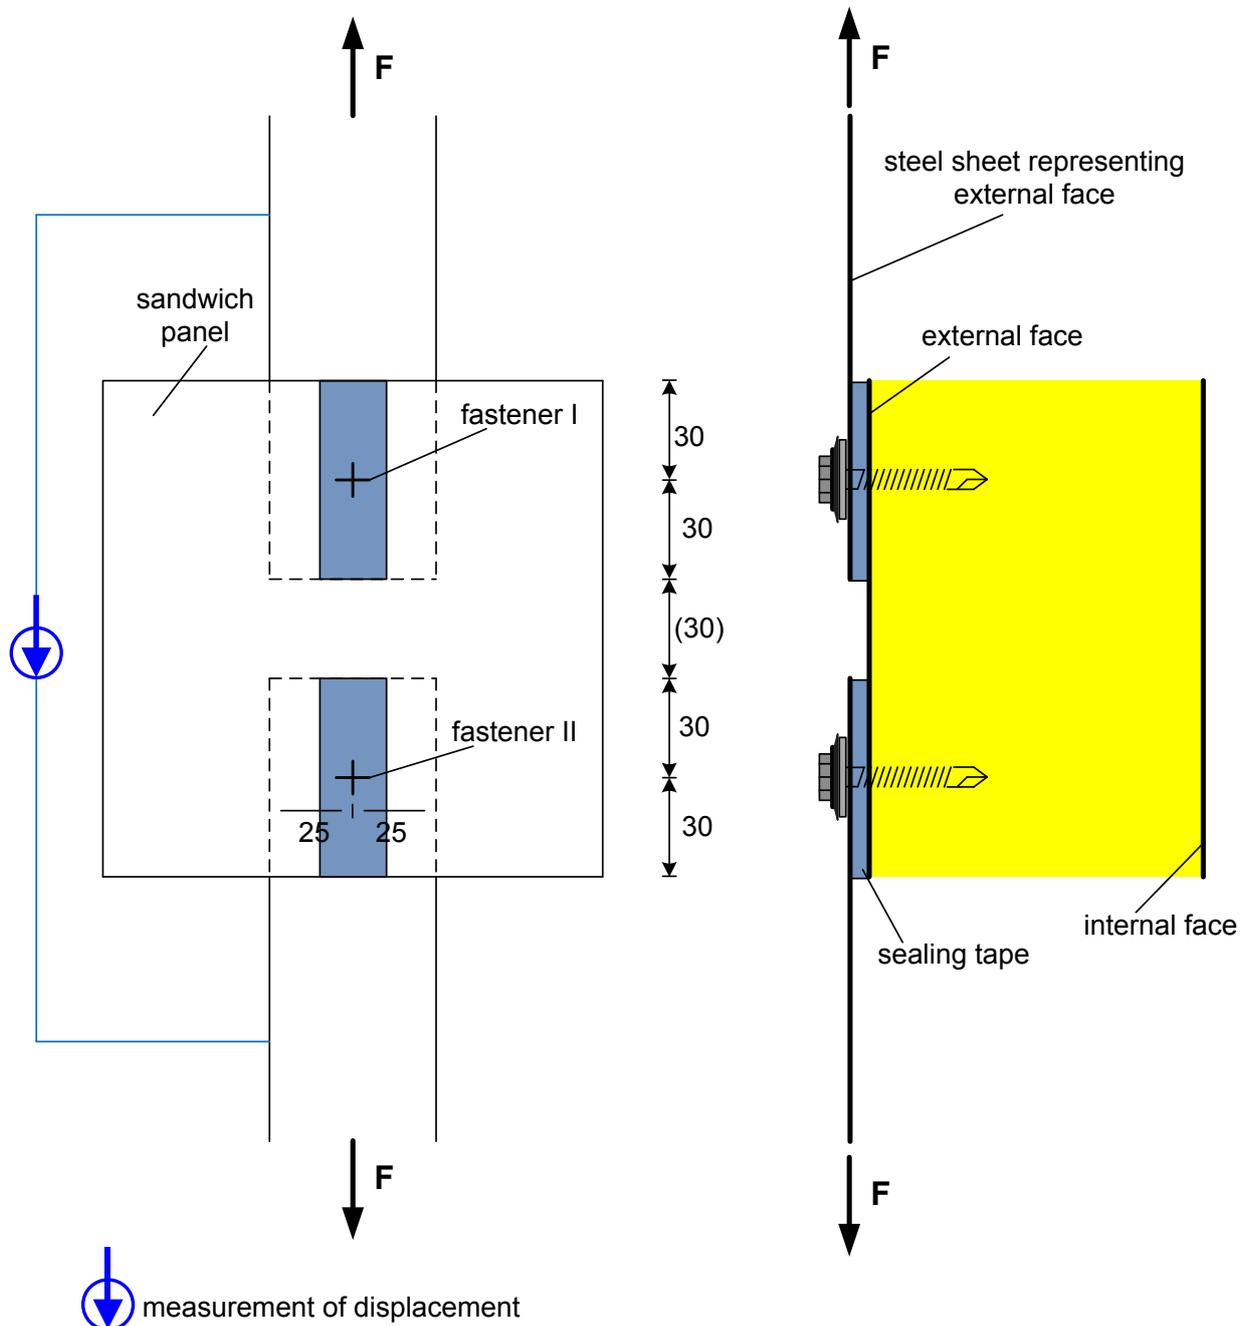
Test set-up of tests on fastenings of longitudinal joints
